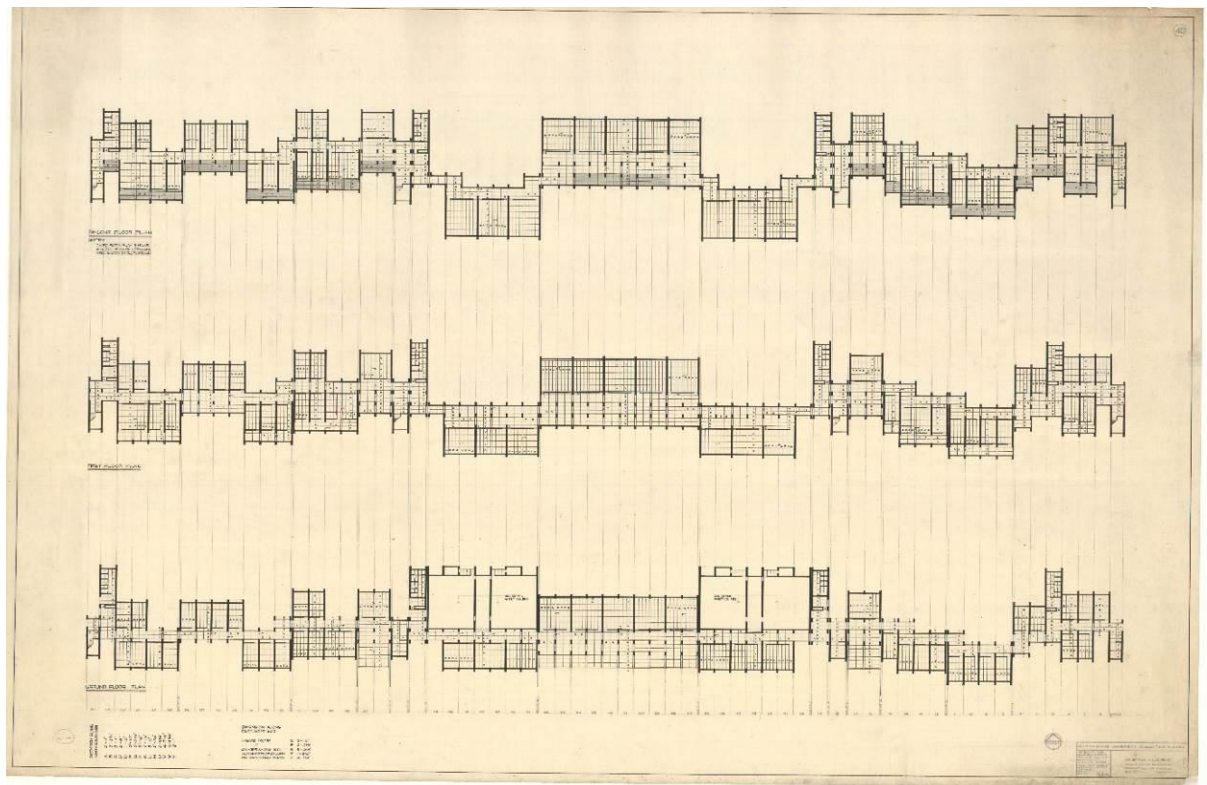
Floor plans of Academic Building, Chittagong University, 1968. Muzharul Islam Archive.
